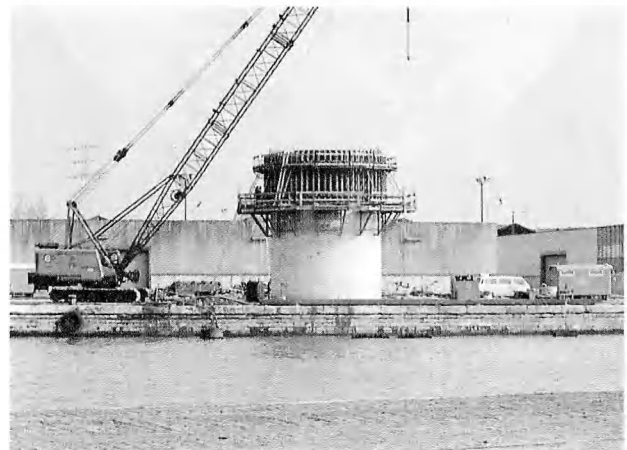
Construction of the entry shaft with a jumping formwork.
